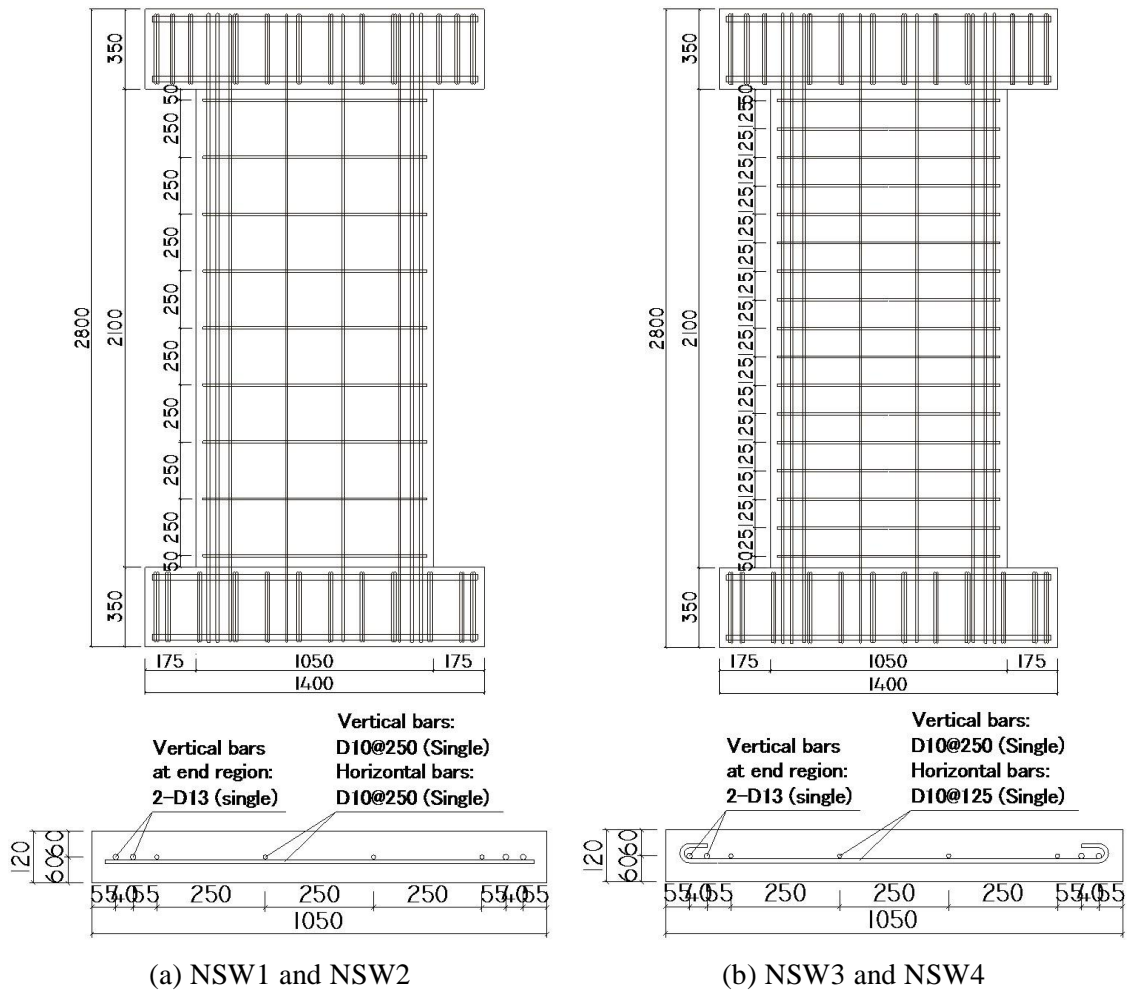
Dimensions and reinforcing details of specimens (unit in mm)
